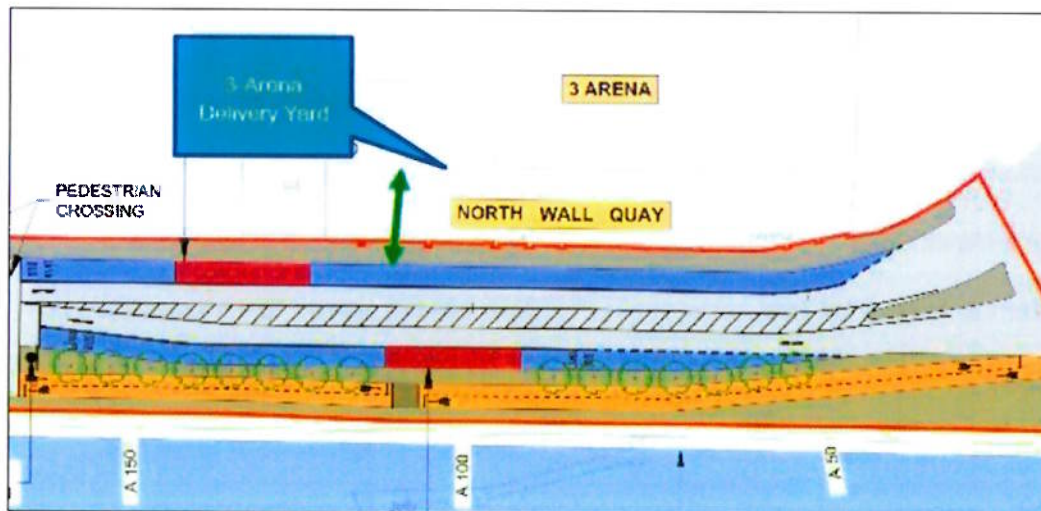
Access Route Proposed by NTA to Service Yard on North Wall Quay
